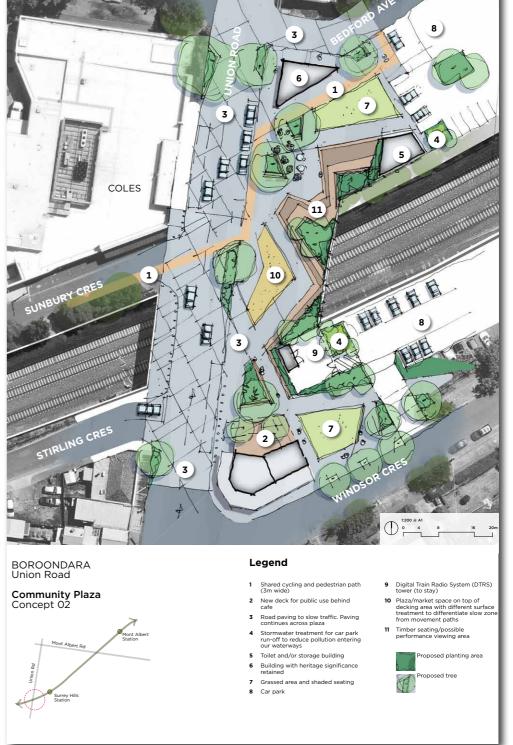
Concept Plans used in consultation for Union Road Plaza (artist impression)
